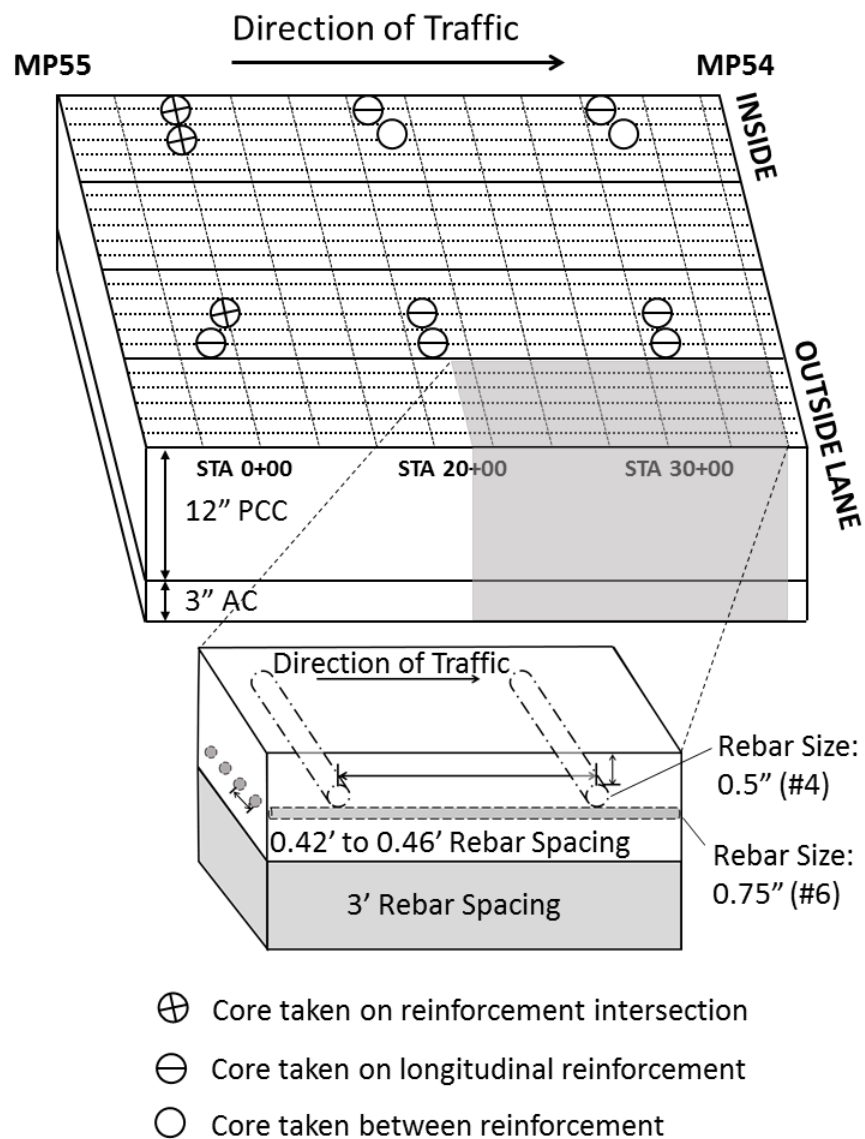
3D View of Pavement Design Parameters for Poor CRC (I-85 MP 55-54)
